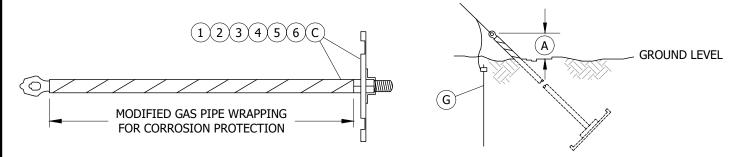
ANCHOR ROD PROTECTION DETAIL, ALL SIZES
